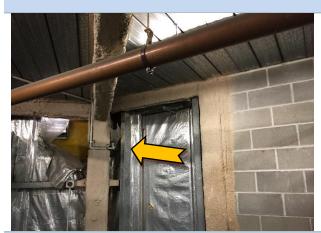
Interior: level 14, plant room, beams, vermiculite – no asbestos detected.
